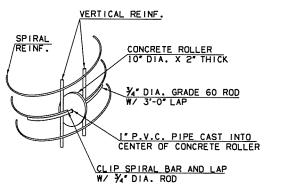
DETAIL OF DRILLED SHAFT ROLLER PLACEMENT
